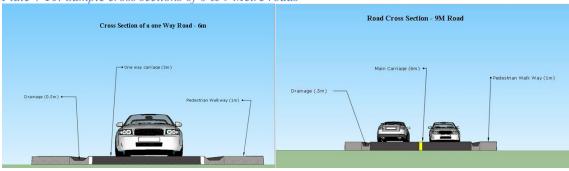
Sample cross sections of 6 & 9 Metre roads
